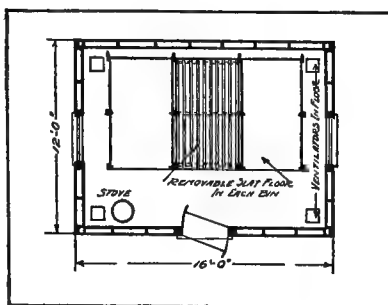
Floor plan of a small sweet potato storage-house (12 x 16 feet) suitable for a farmer who has 300 to 500 bushels of sweet potatoes to store.
